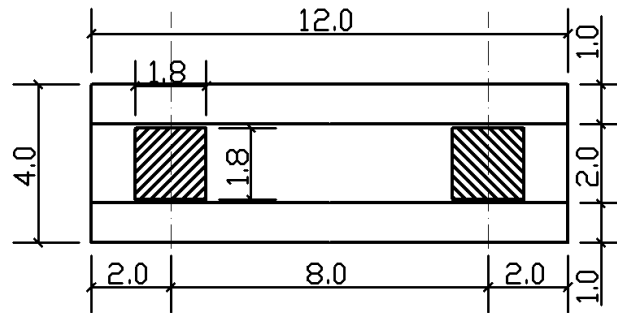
Alharamain Bridge Pier #4 and Pier #7 footing details
